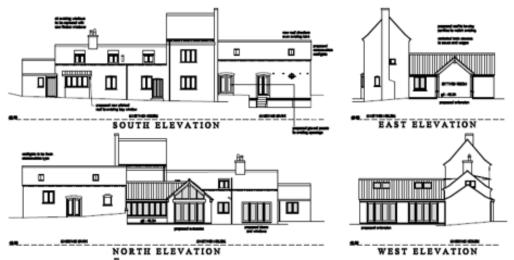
Approved Elevations under 14/01991/FUL (barn elevations amended by 17/01330/FUL & 20/00536/FUL)
